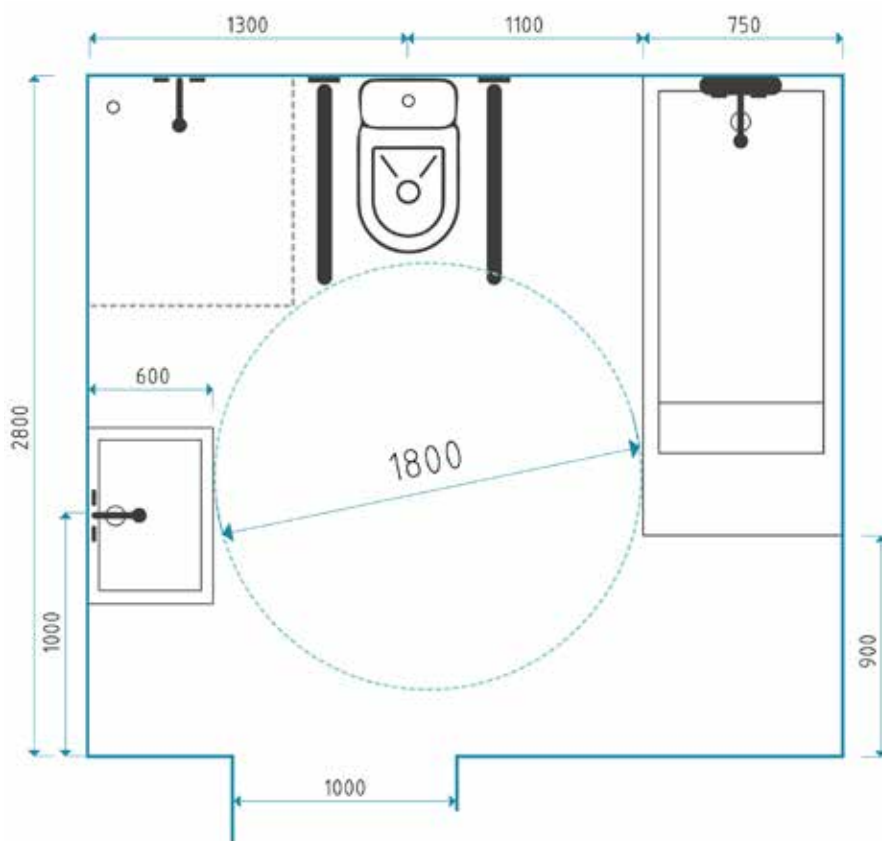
Accessible bathroom with bathtub, peninsular toilet and space for transfer (Suláková according to EN 17210:2021)
